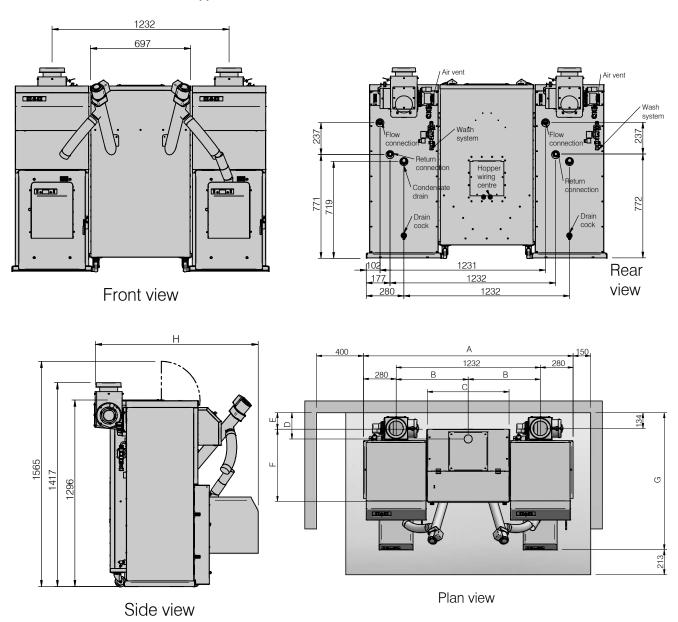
Boiler and hopper dimensions and clearances – double boiler with central hopper
